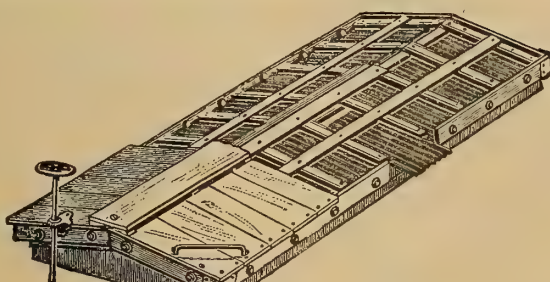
SECTIONAL VIEW OF ROOF.
